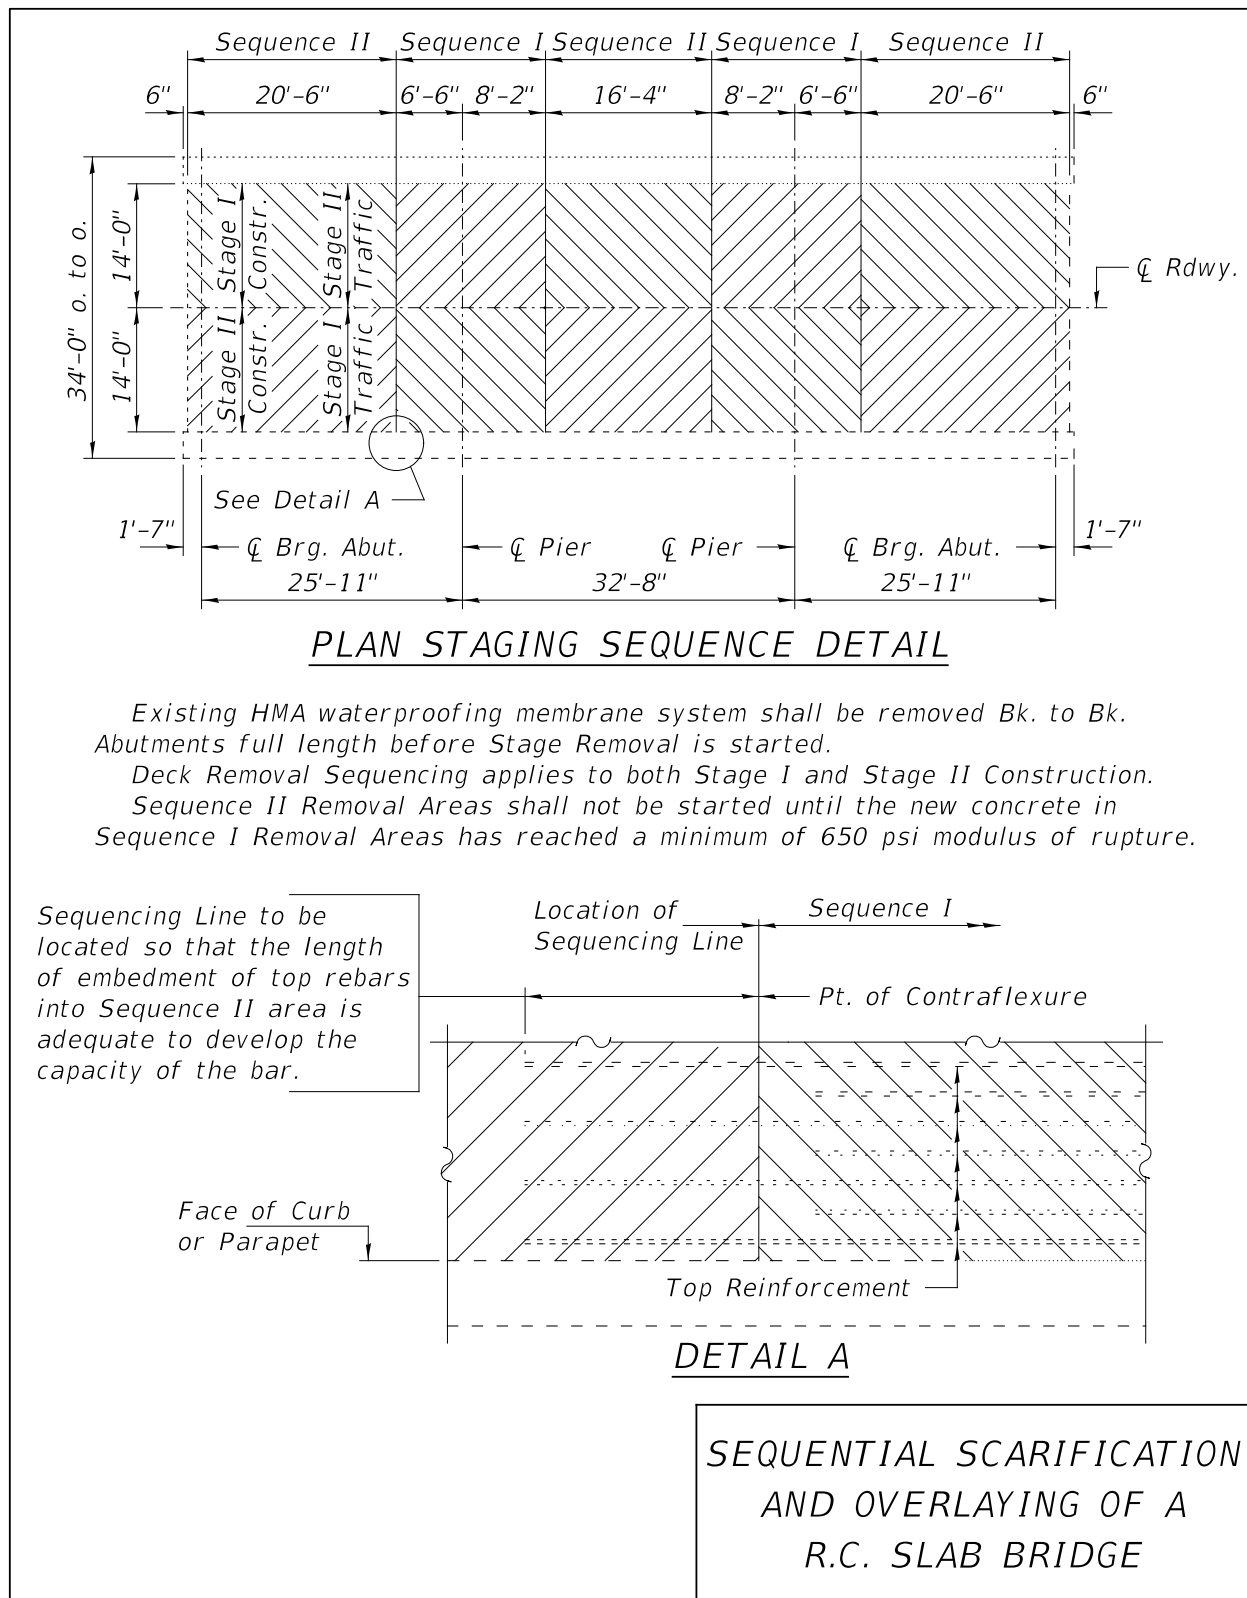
Sequential Scarification and Overlaying of a R.C. Slab Bridge
